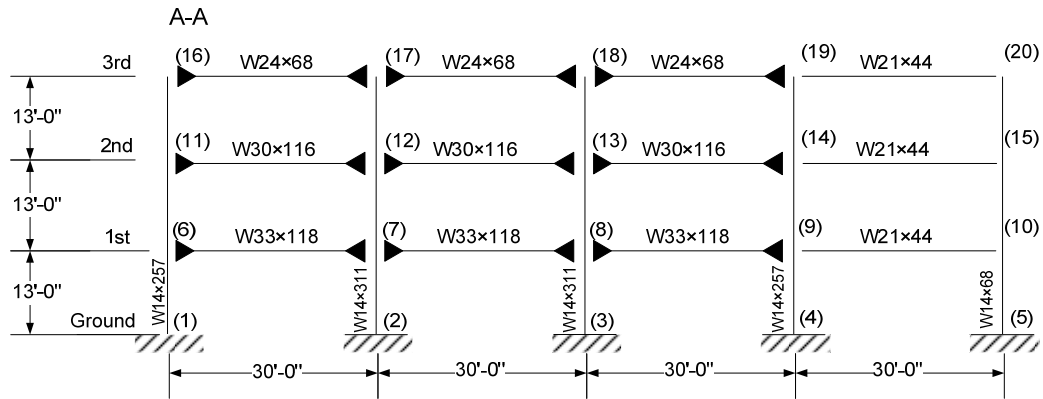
3-story benchmark building N-S steel moment-resisting frame
